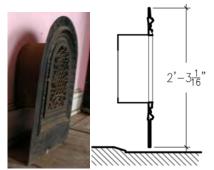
Fireplace grille photo and Figure 3-186: Fireplace man Beginer Brinder Beile, Architects & Planners, LP file. (Photos: BBB, 2006)
